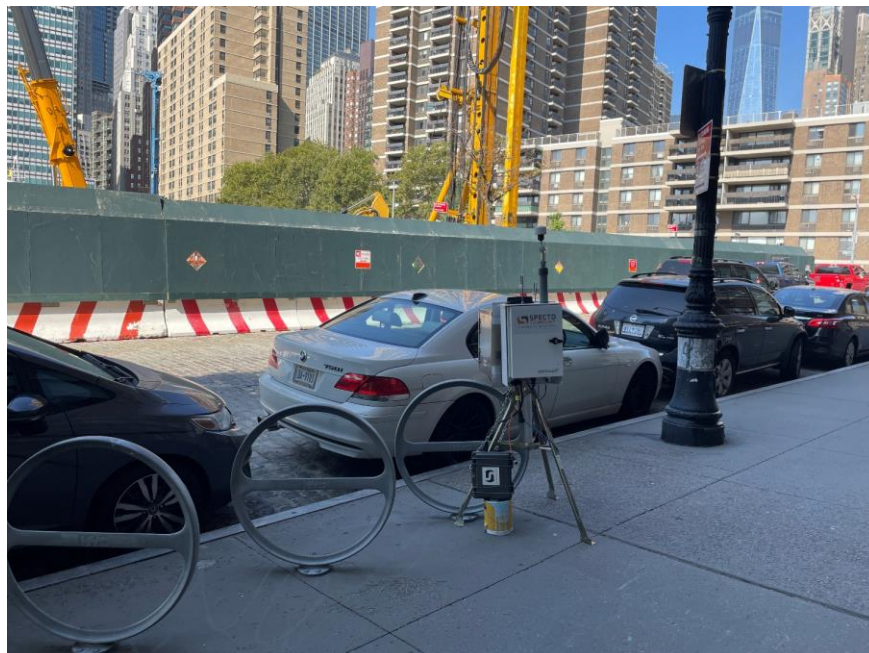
CAMP station WZ-3 on the eastern sidewalk of Peck Slip (facing northwest)
